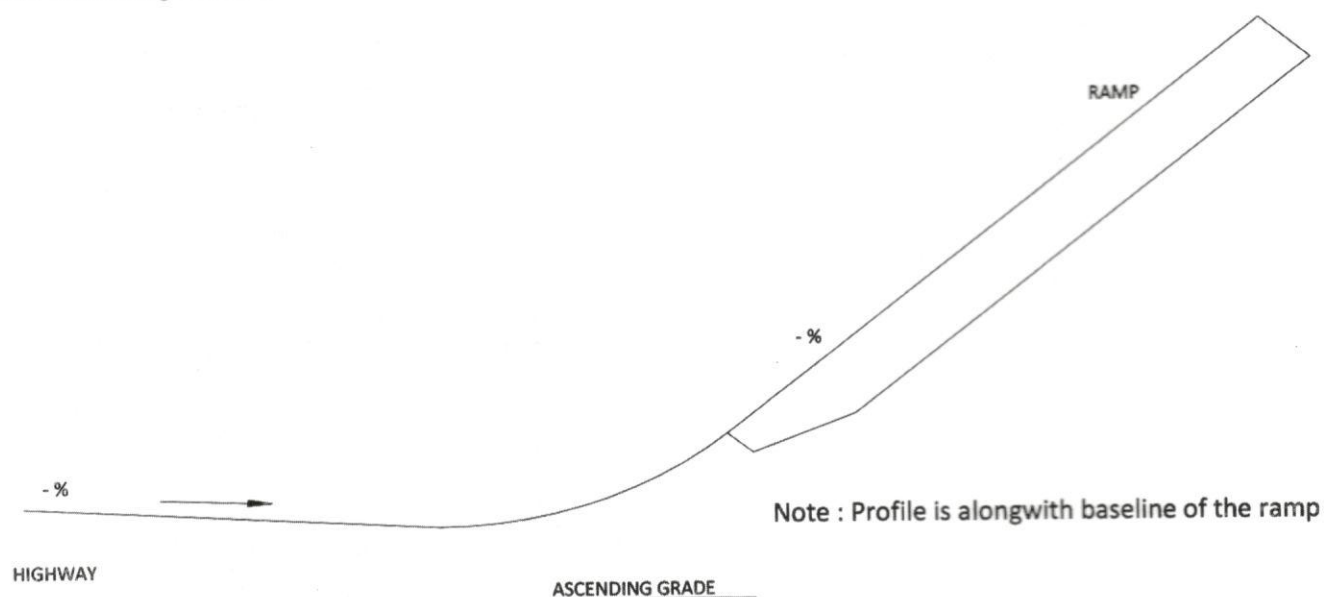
Typical Type of Emergency Escape Ramp
